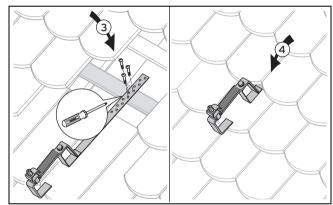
Screw on the type S roof bracket and lay the slates again (shown here: on the roof batten)
